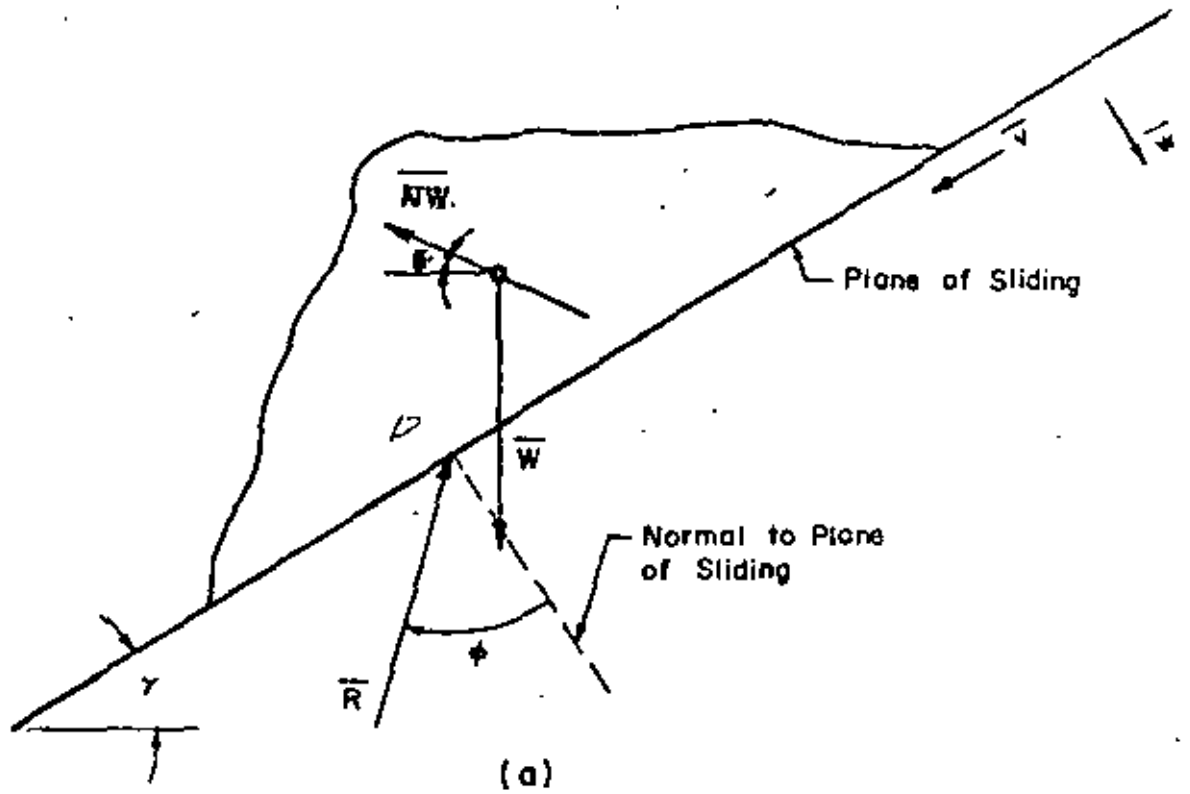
FAILURE OF A BLOCK SLIDING ON ONE PLANE
